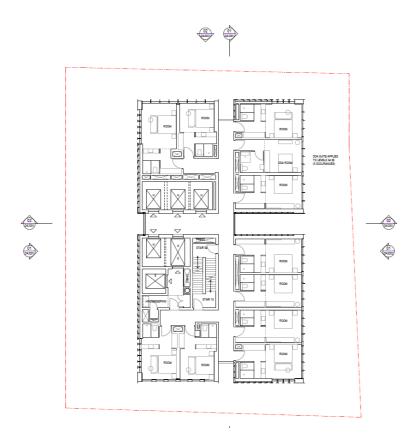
| Proposed levels 34-45 (Source: Woods Bagot)
